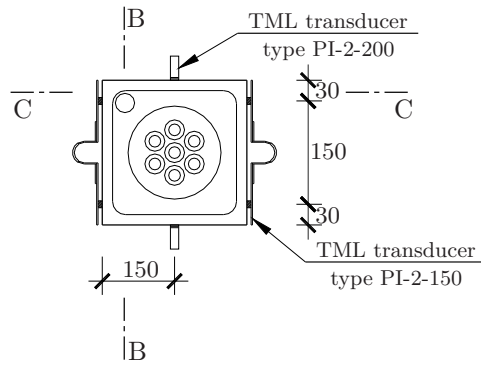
Location of the measuring equipment of specimens P4, P5 and P6 - Section A-A
